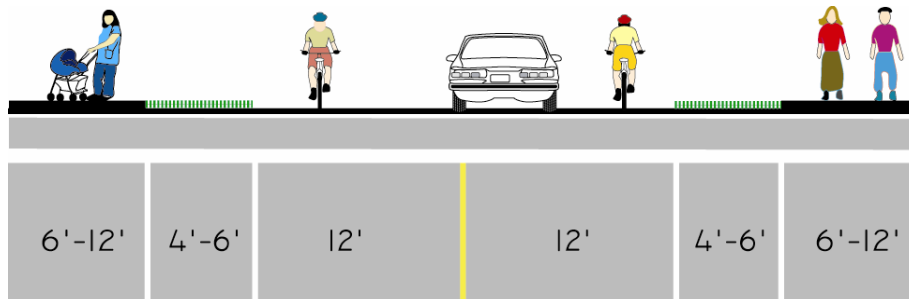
On-Street Facility on a Low Volume, Low Speed Roadway
